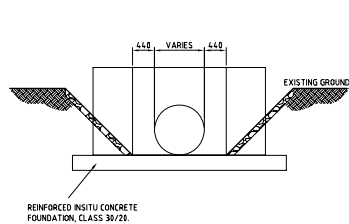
DETAIL A: SINGLE-LEAF BLOCKWORK HEADWALL
